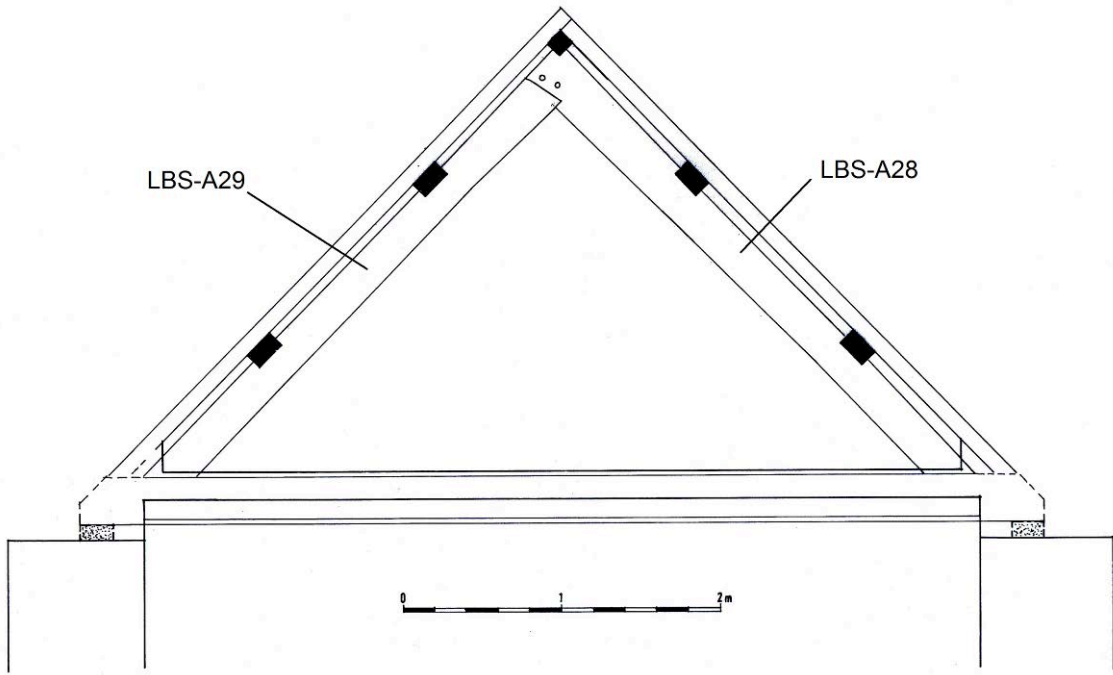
Central hall/parlour range; truss 3 (east face), showing the location of samples LBS-A28 and LBS-A29 (Martin Roberts)
